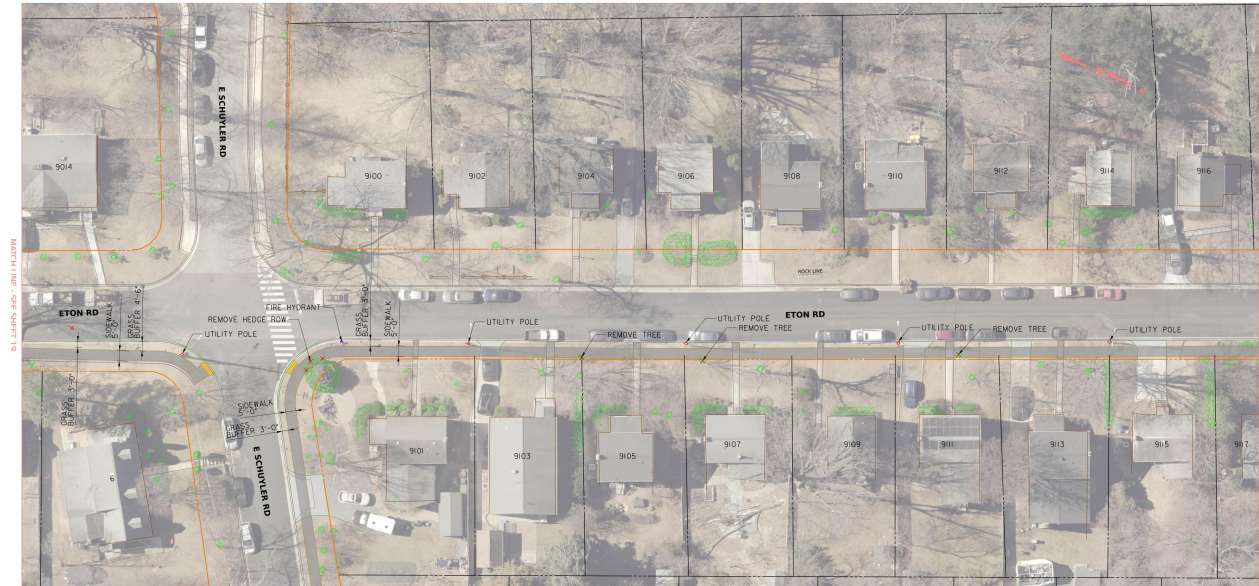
Plan view of proposed sidewalk improvements along Eton Road and E. Schuyler Road. The drawing overlays proposed 5-foot concrete sidewalks, ADA curb ramps with detectable warning surfaces at the intersection, grass buffer areas (3-foot typical), retaining wall segments, approximate right-of-way lines, utility poles, fire hydrant location, tree removals, hedge removal, and property lot lines for residences numbered approximately 9010–9117. A match line indicates continuation on Sheet 28.
